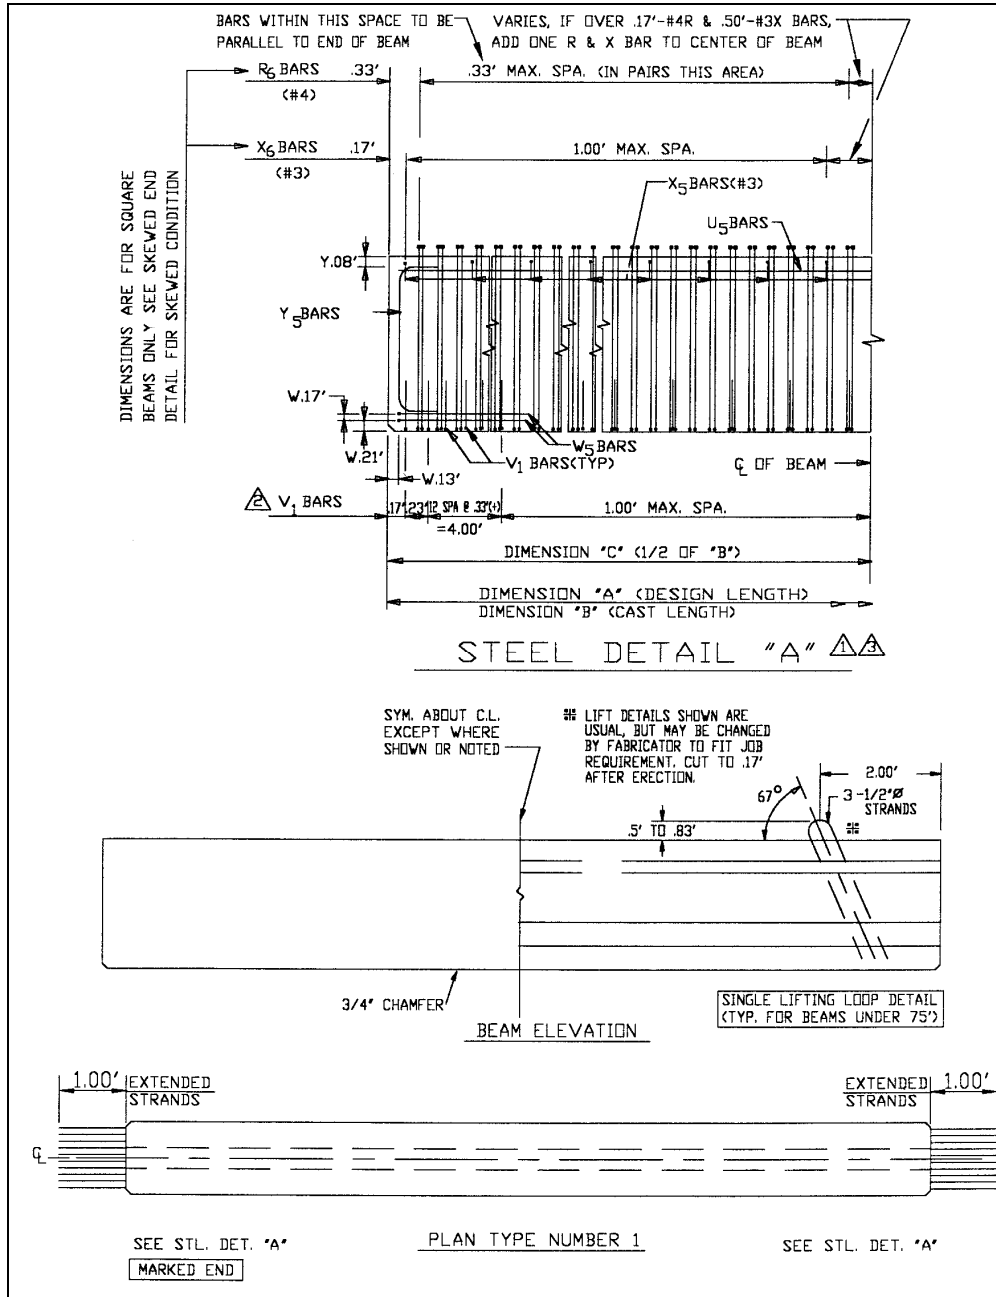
Normal-strength concrete test beam shop drawing (Part 3 of 3)
